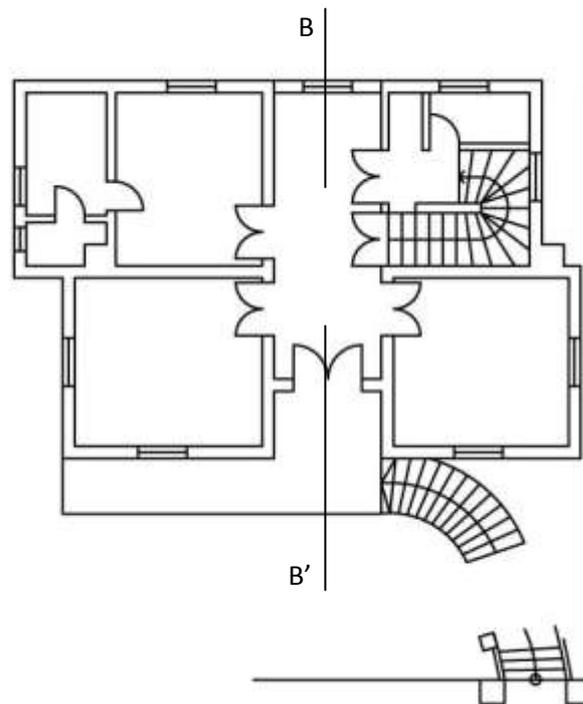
First (entrance) floor plan of the house at 147 lot 3 parcel
